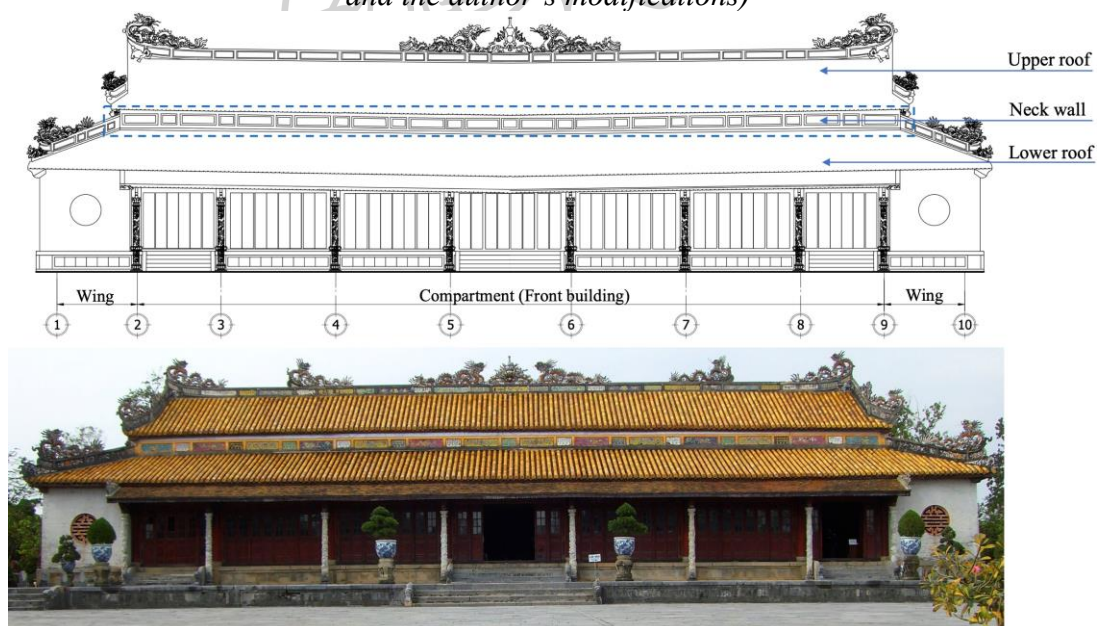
A typical elevation with an upper roof, a lower roof, and a neck wall
